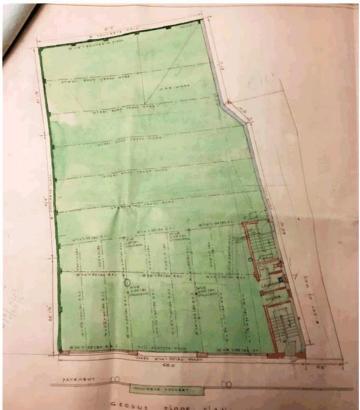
Ground floor plan. The green area shows the building footprint, and area of excavation. The right of way on the north eastern side is indicated (TAHO, AE417/1/2108, 125 Bathurst Street (6871).
